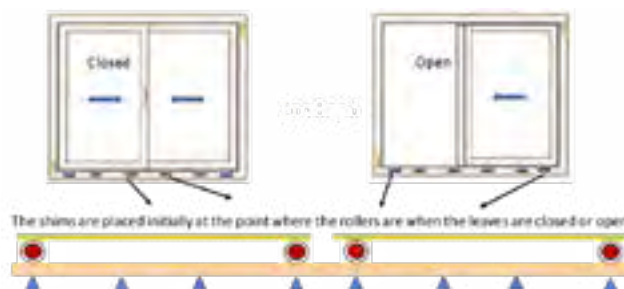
Sliding fenestration shimming (Technical Manual of Windows Installation, POVAS 2019)
